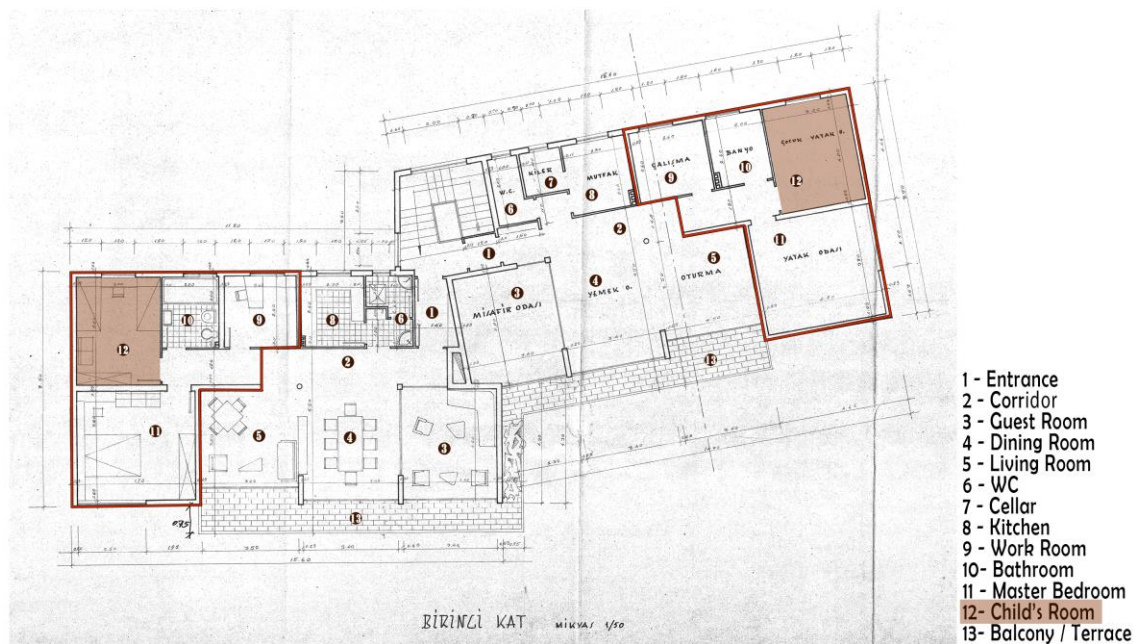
The first-floor plan of Muammer Aksoy and Relatives' House, Ankara (Source: VEKAM, SMB154_plan_02)
